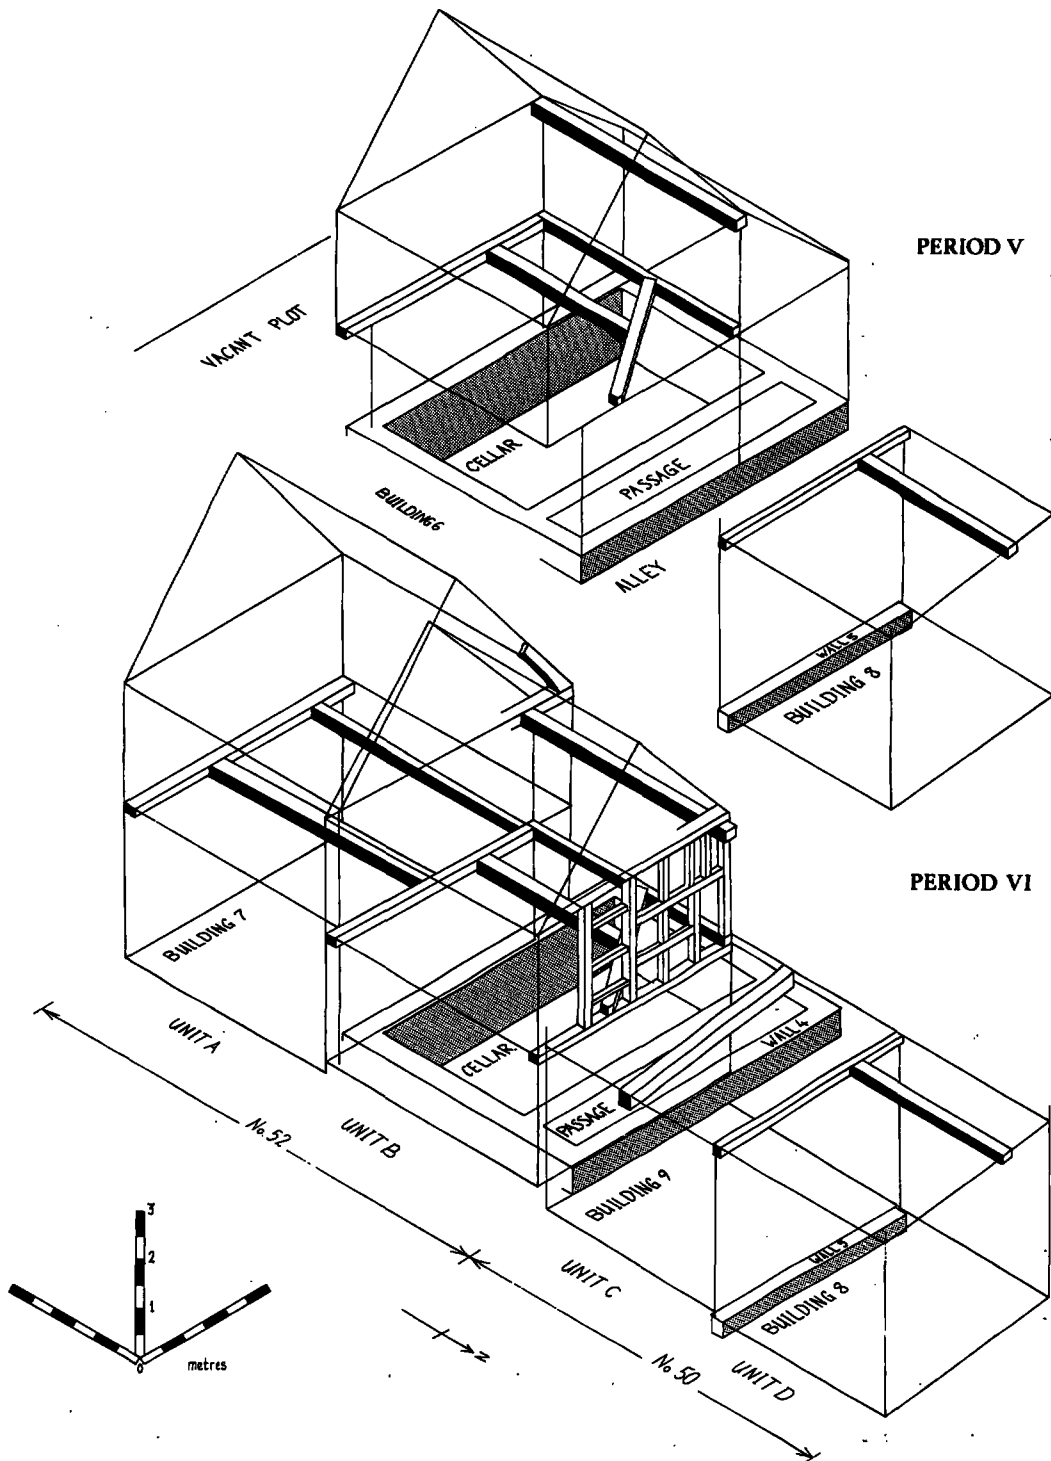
Johnson's Corner: isometric reconstruction drawings of nos 50-52 High Street in Periods V and VI. Surviving timbers are shown with solid black on one side.
